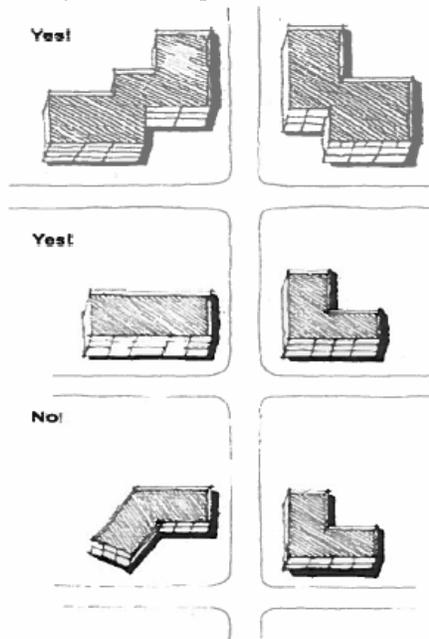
Within each intersection quadrant, new buildings shall be organized to align with existing buildings located across the intersecting thoroughfare streets.
